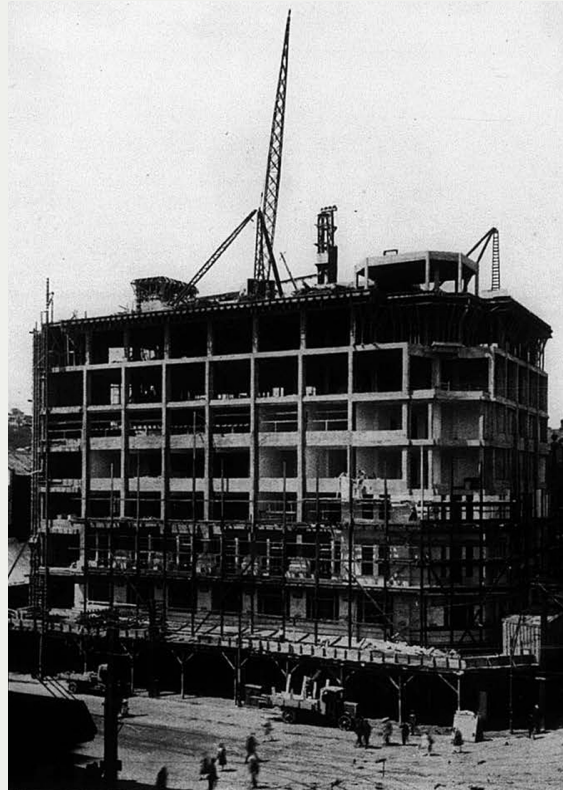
The Dilworth Building, N.Z. *Architectural & Building Review*, January 31, 1927. The structure can be seen behind the stone façade.
